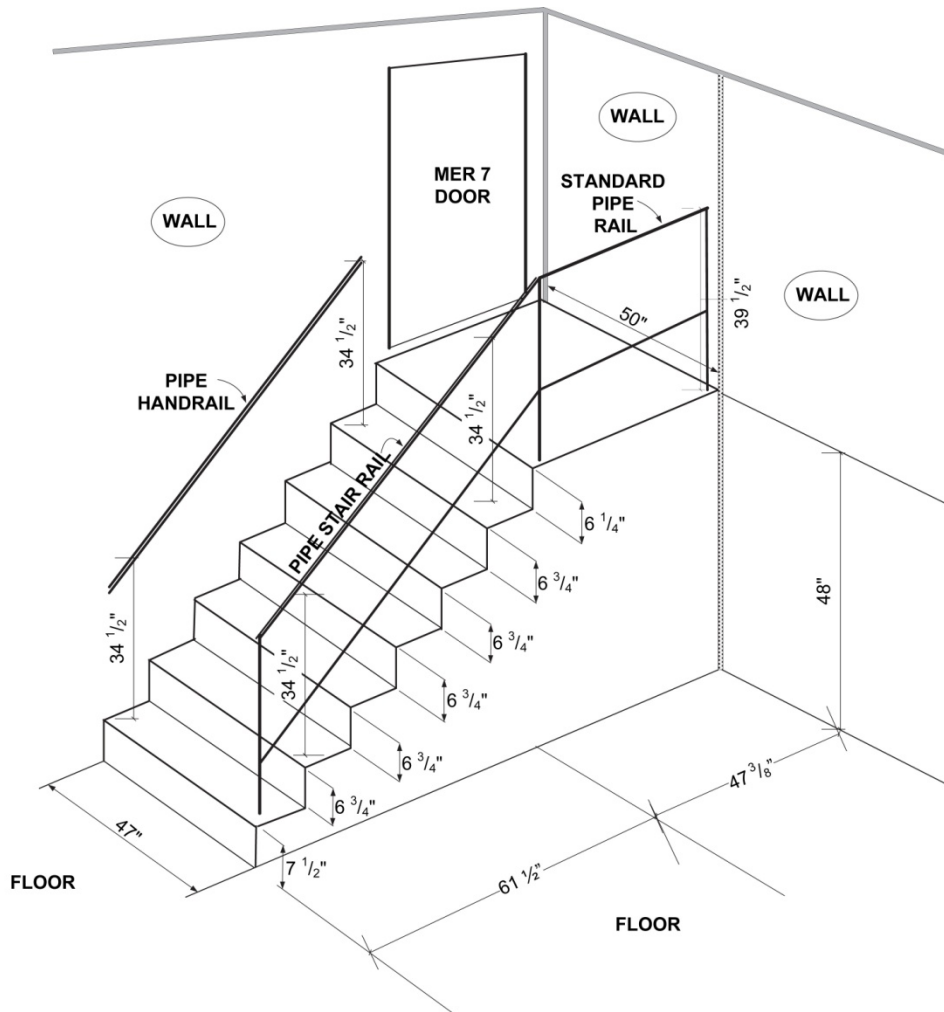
Isometric Drawing of Mechanical Equipment Room 7 Stairs
